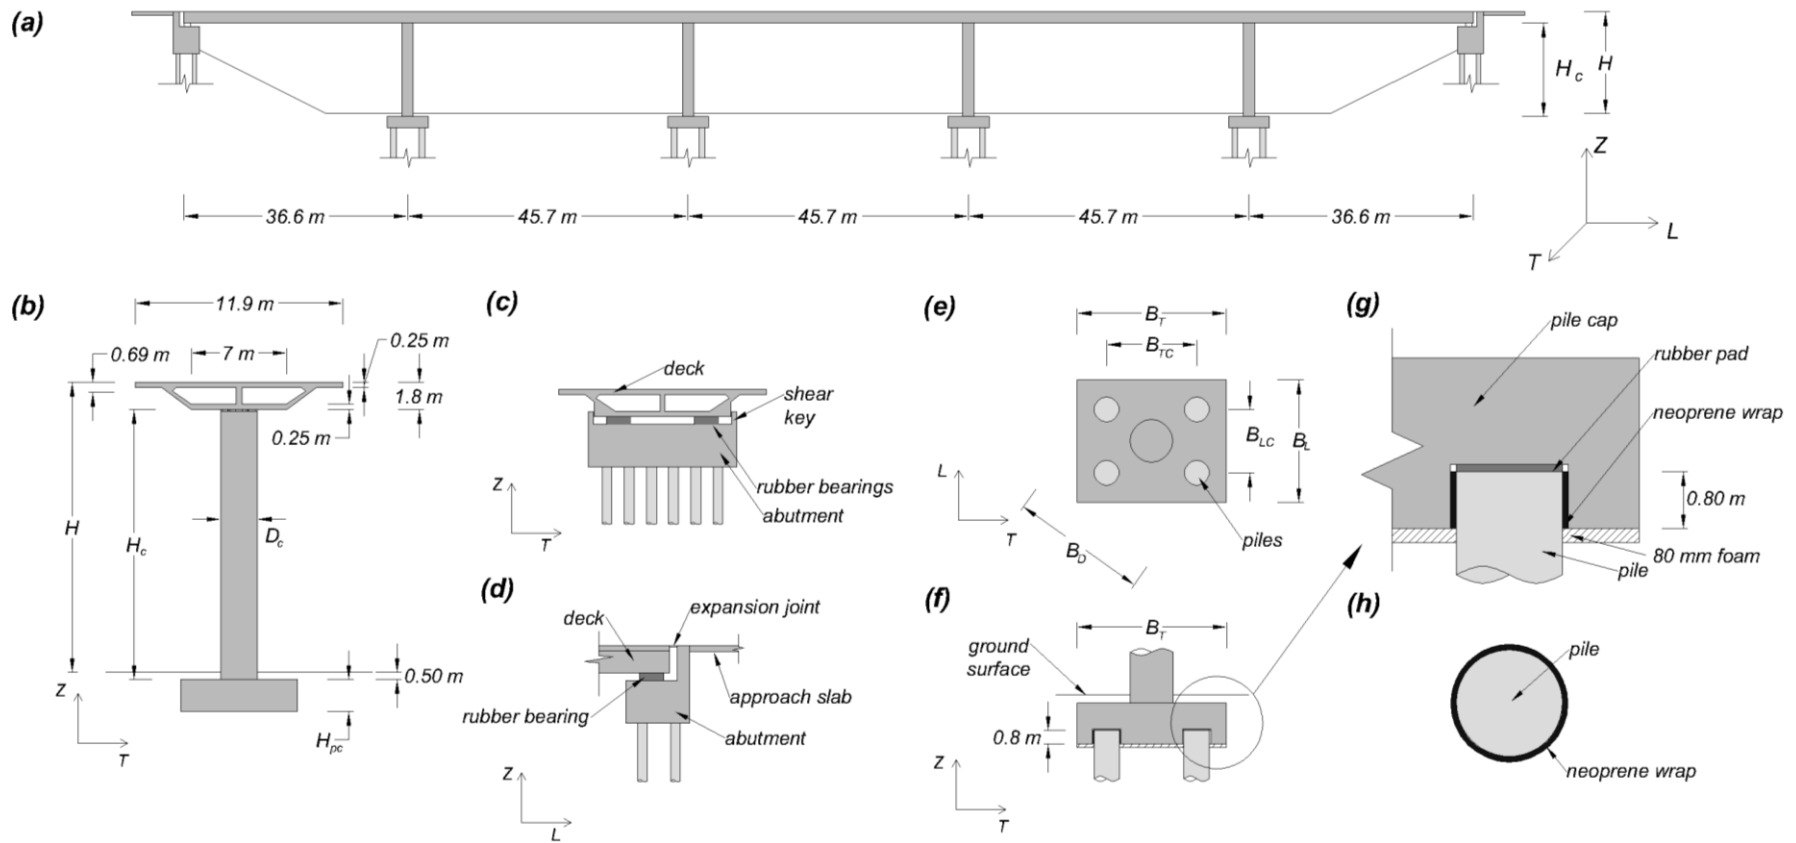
Geometric characteristics of the bridges: (a) side view of the whole bridge; (b) elevation view of the foundation-column and deck of bridge RSF17; (c) elevation section view of abutment, bearings, and deck of the bridges; (d) side elevation view of abutment, bearing, deck and expansion joint of all bridges; (e) plan view of the pile foundations; (f) elevation section view of the rocking pile foundations; (g) elevation section view of pile cap to pile connection of the rocking pile foundations; and (h) section view of pile and neoprene wrap of the rocking pile-foundations.
